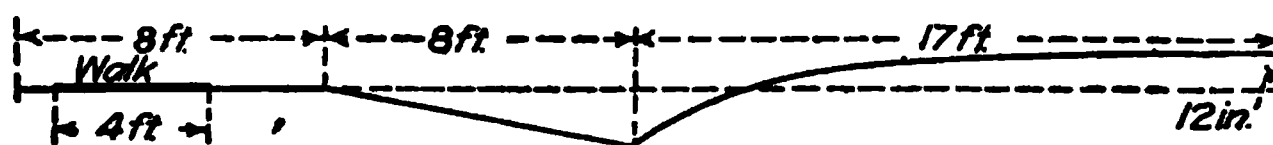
CROSS SECTION OF VILLAGE STREET.
